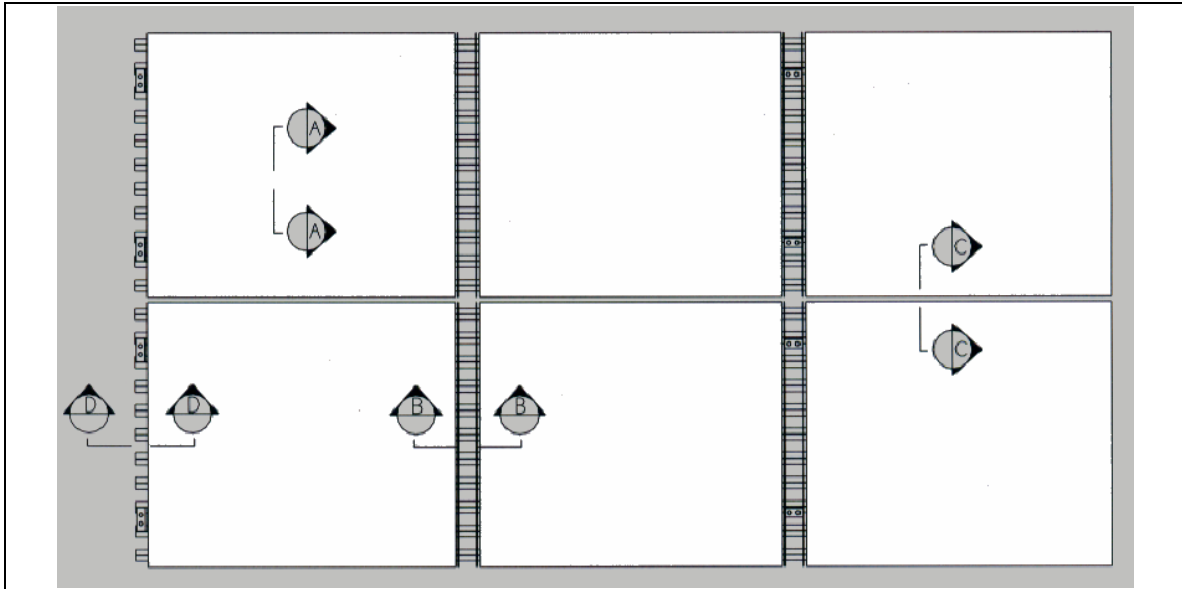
Typical panel layout plan (Exodermic Bridge Deck, Inc., 1998)
